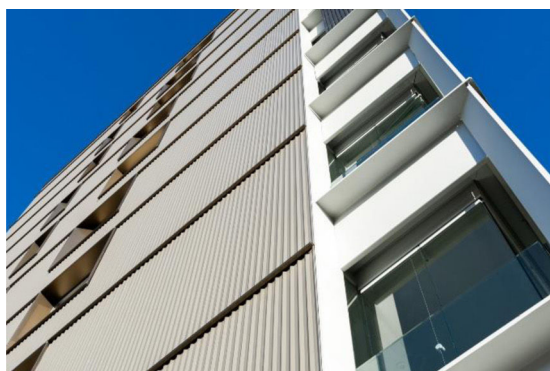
Ripagaina Park residential building, Pamplona, Navarra – Spain. Ventilated facade made of aluminum composite material.
